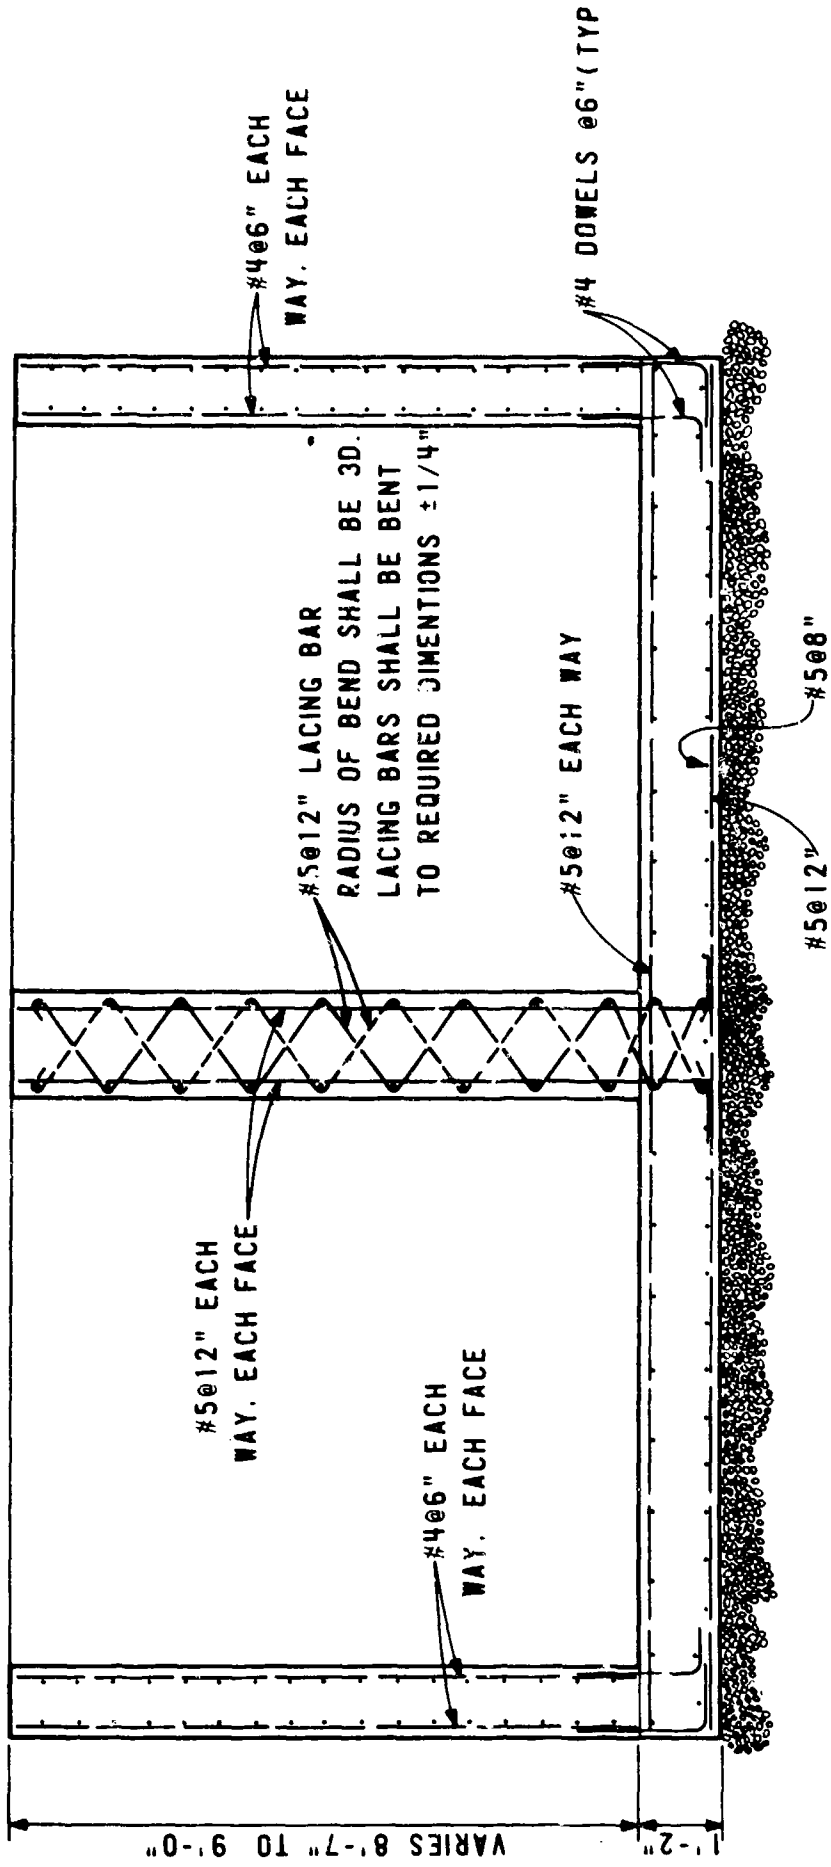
LONGITUDINAL SECTION - REINFORCING DETAILS
